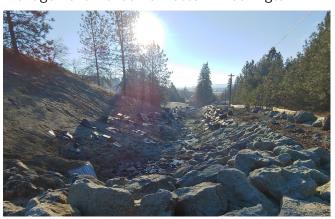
New culvert and stormwater runoff channel along an improved section of Bigelow Gulch Road
